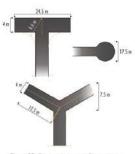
Design requirements for a private driveway longer than 50 metres terring areas should allow type 3:4 fire appliances to terr soft
